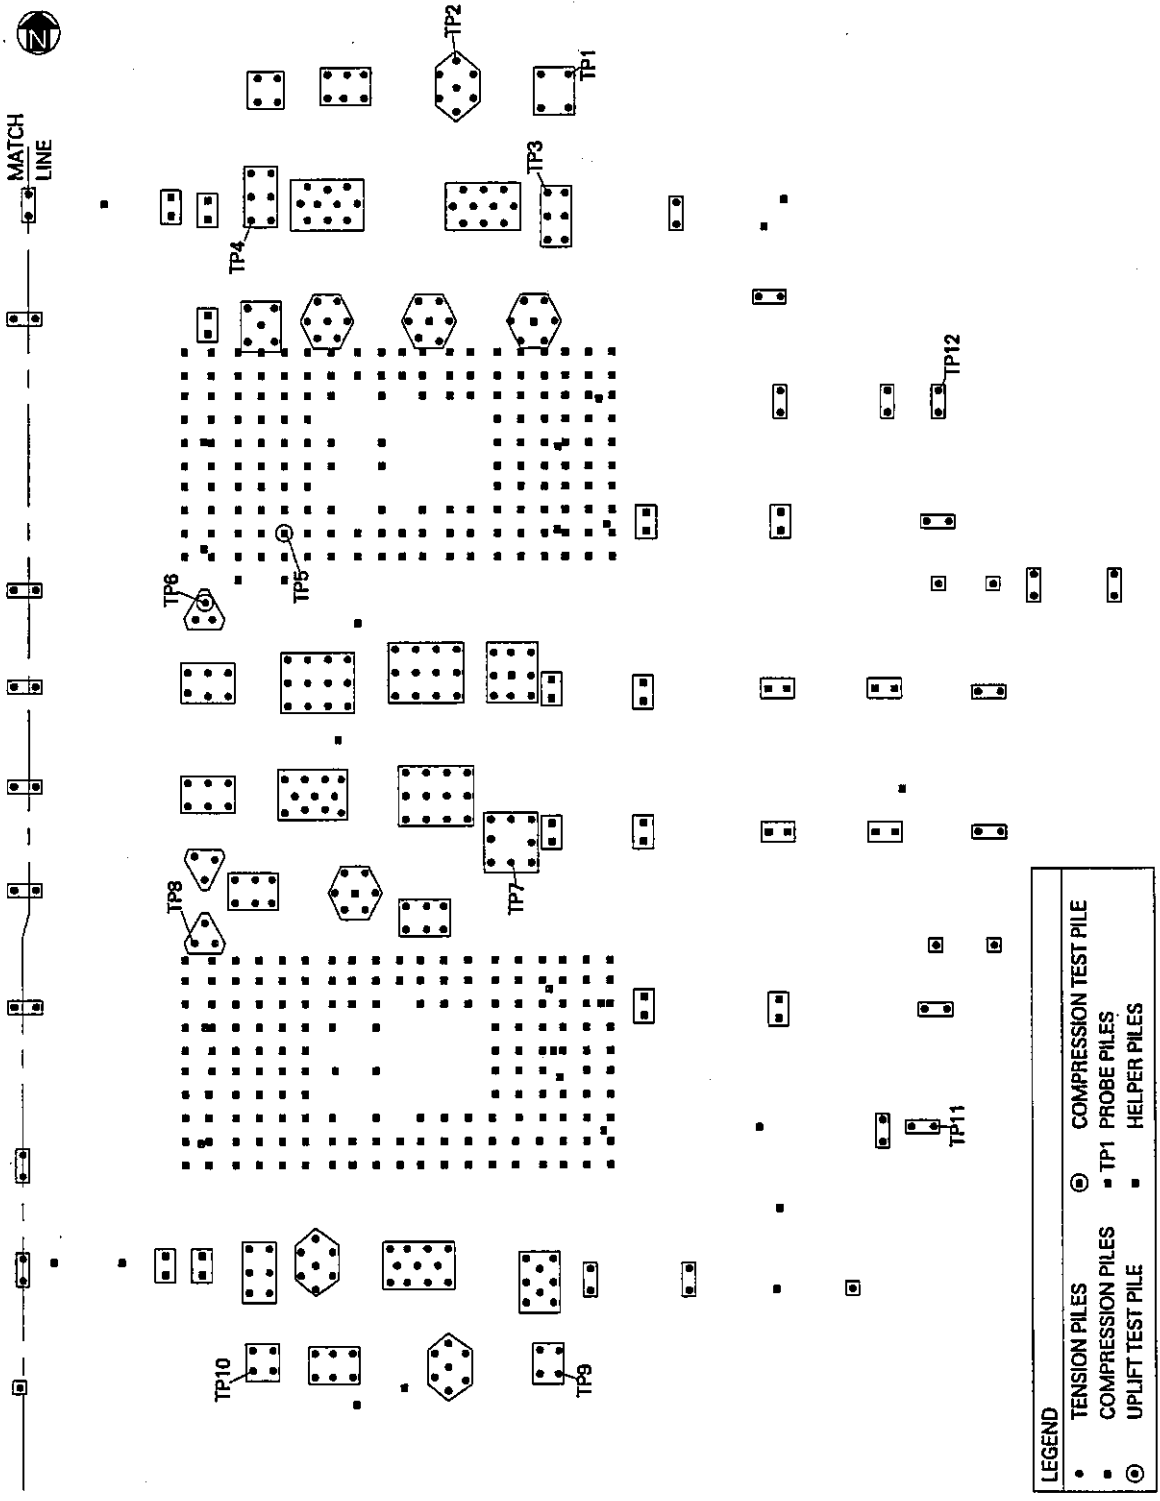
Pile Layout Plan and Loading Test Locations, Tower Area
